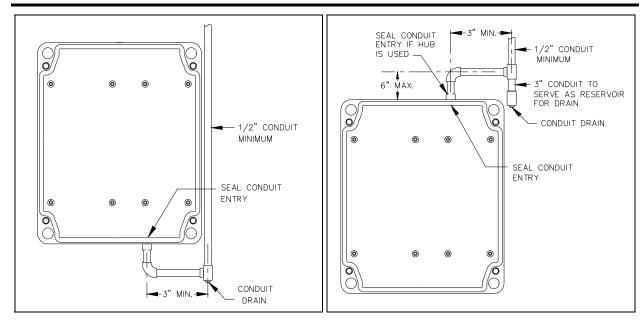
Model 246-700 & 256-700—Bottom entry conduit installation details
